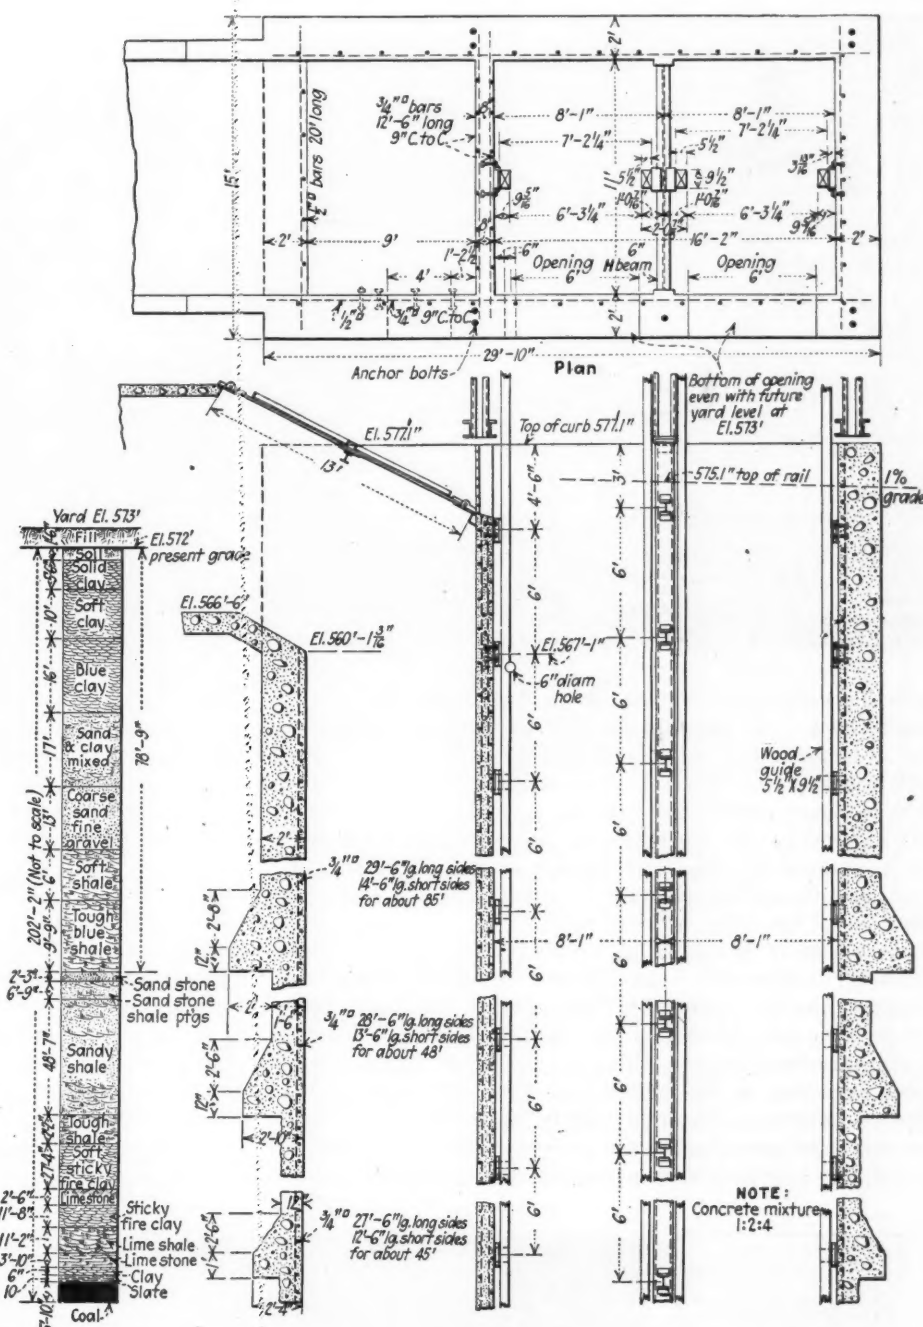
PLAN AND CROSS-SECTION OF AIRSHAFT AND COLUMNAR SECTION OF MEASURE OVERLYING COAL
